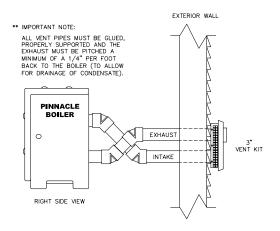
PI-80, PI-140, PI-199 Sidewall Venting with 3" Pipe (3" Vent Kit).
